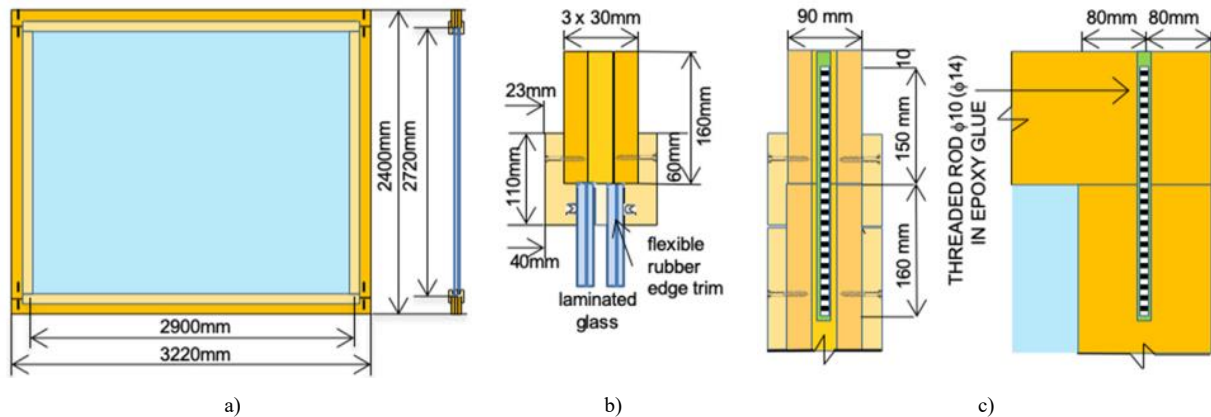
Full-scale CLT-glass facade element (figure reproduced from (Žarnić et al., 2020) with permission from Elsevier): a) front view, b) glass-to-CLT frame connection detail (cross-section) and c) timber corner joint.
